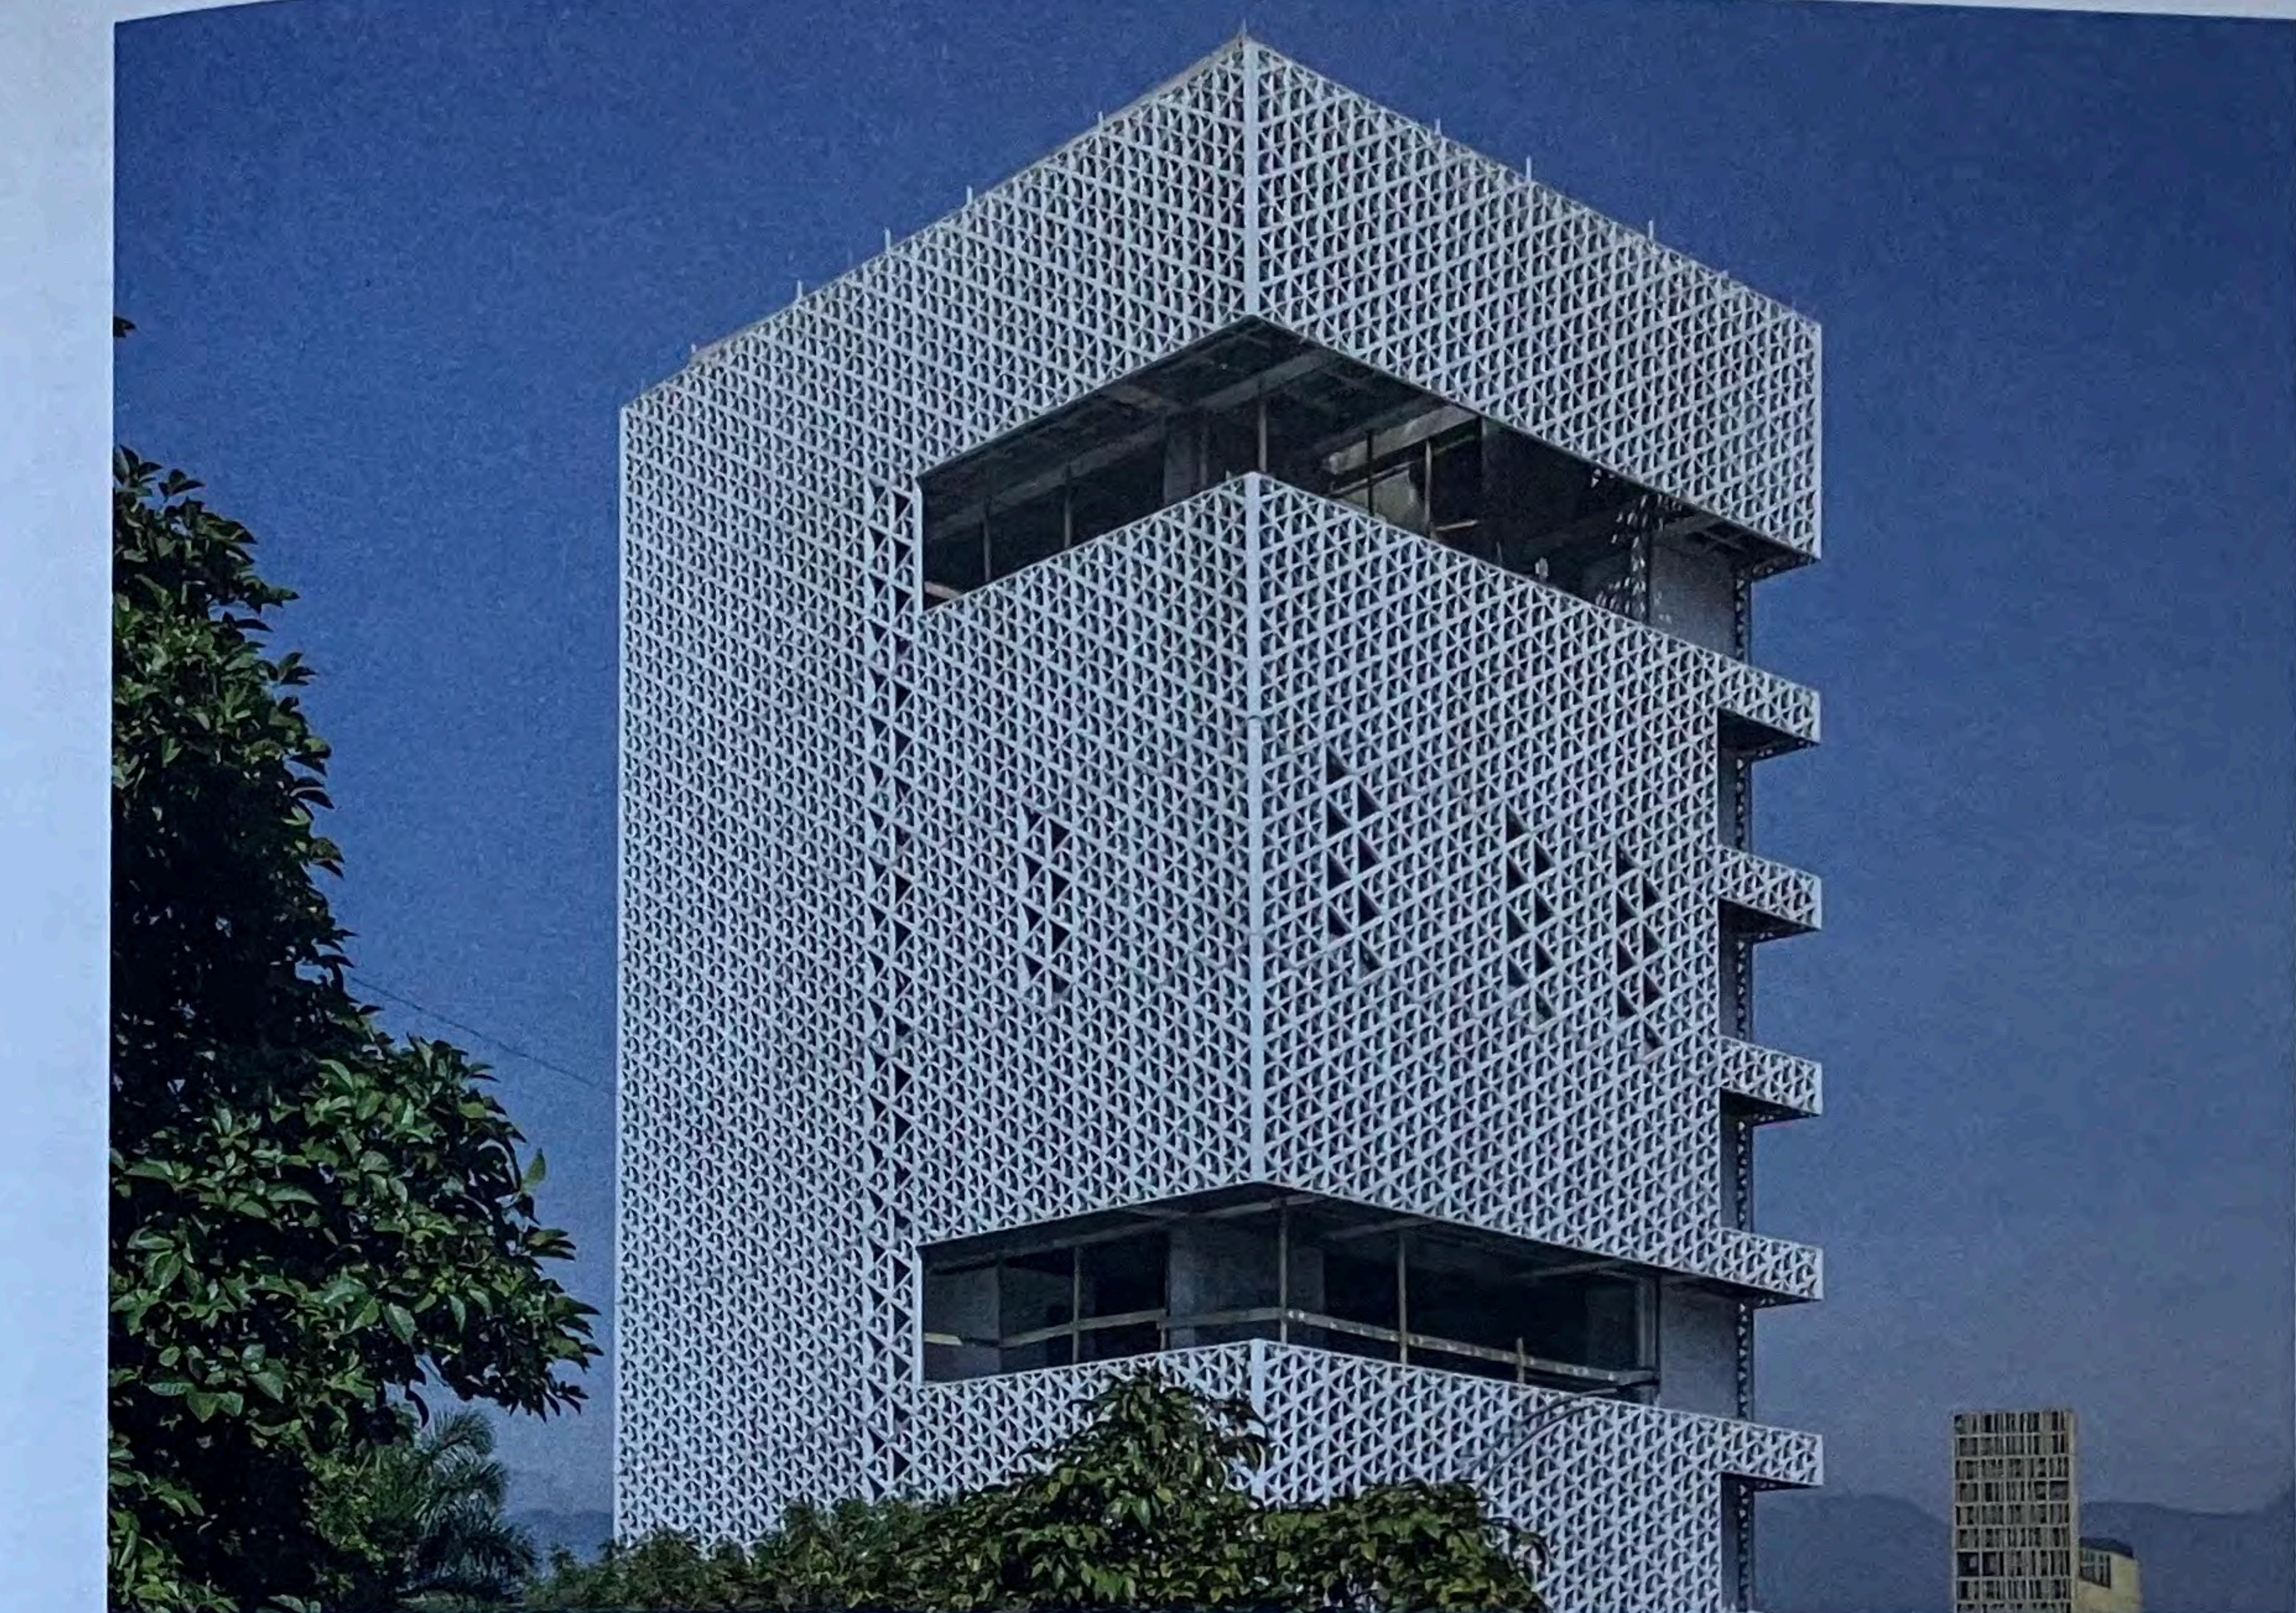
The exterior shading screen is made from prefabricated Glass-fibre Reinforced Concrete (GRC). A single-glazed facade will be fitted behind the screen, on the interior side. The lack of HVAC infrastructure means double or triple glazing is unnecessary.
